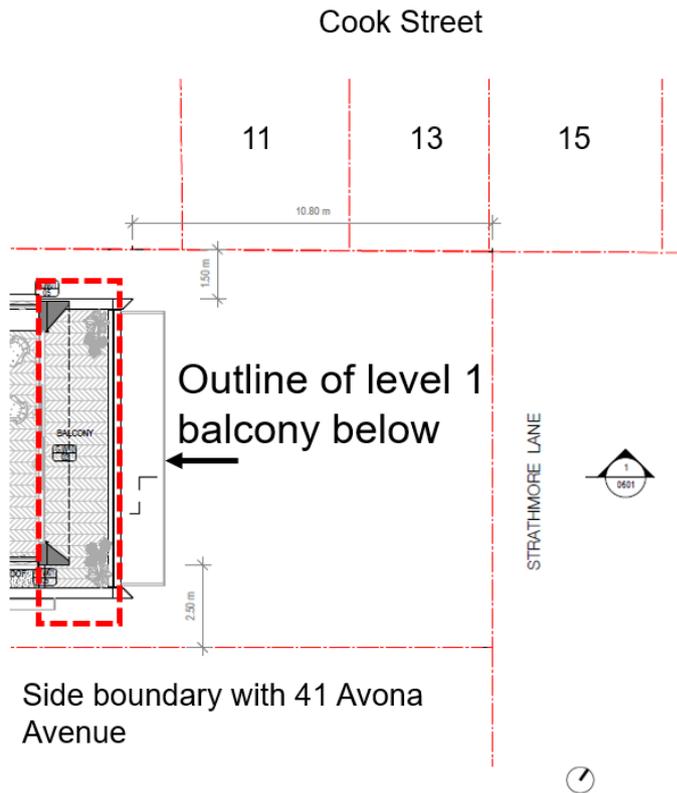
Proposed level 2 plan. Level 2 balcony to be modified is outlined by red dashed lines.
